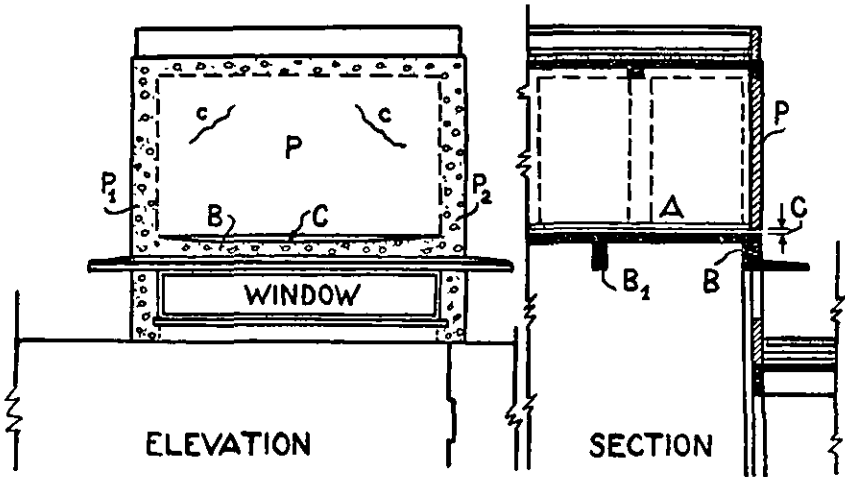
Creep of a reinforced concrete beam in a building. Reinforced concrete in elevation shown dotted, in section shown full.
